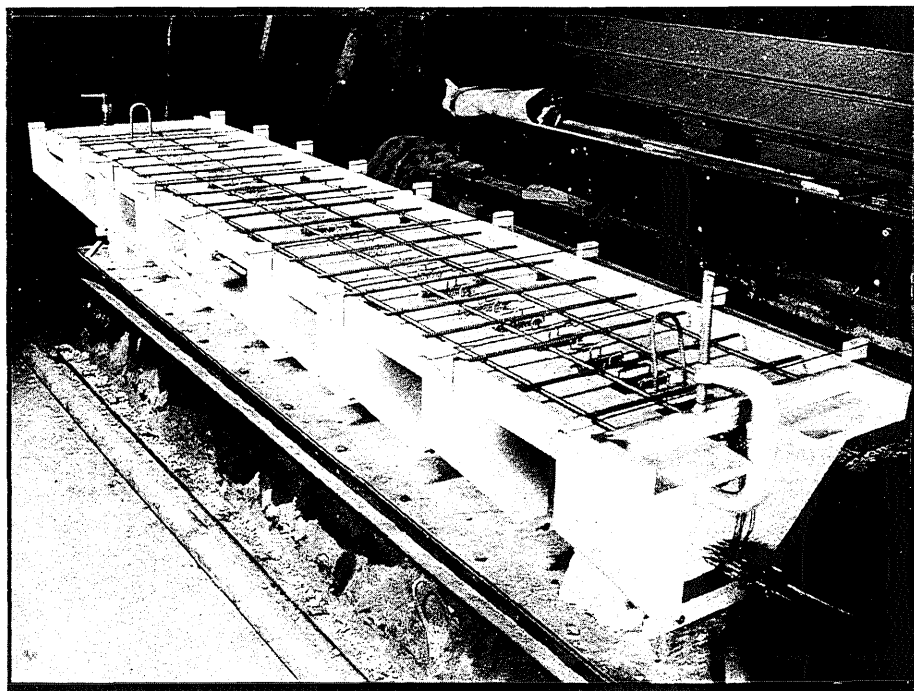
BEAM G34 BEFORE CASTING THE SLAB
